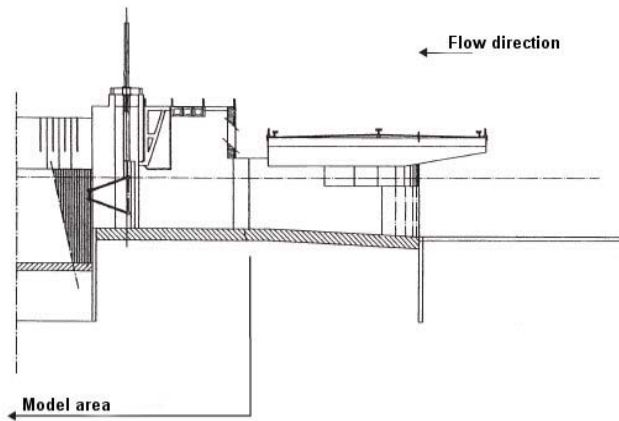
Case study: bed protection downstream of sluice; vertical section of sluice
